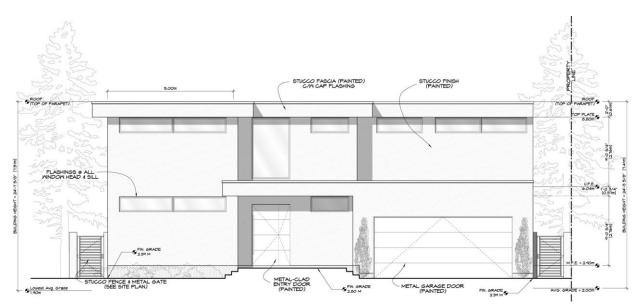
Proposed Front Elevation – viewed from Waring Place (from plans by Zebra Design)
